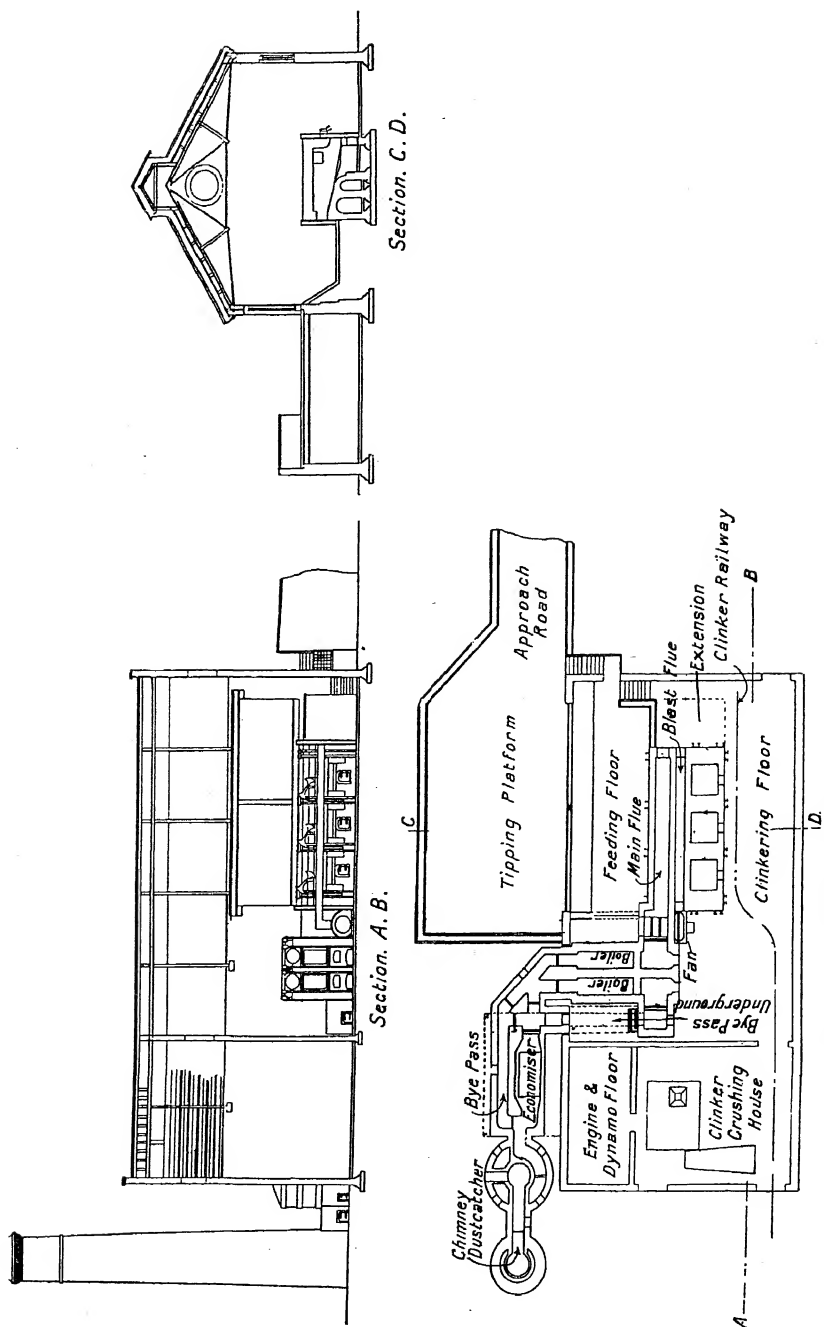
Horsfall's Back-Fed Destructor at Bloemfontein. Plan and sections.
